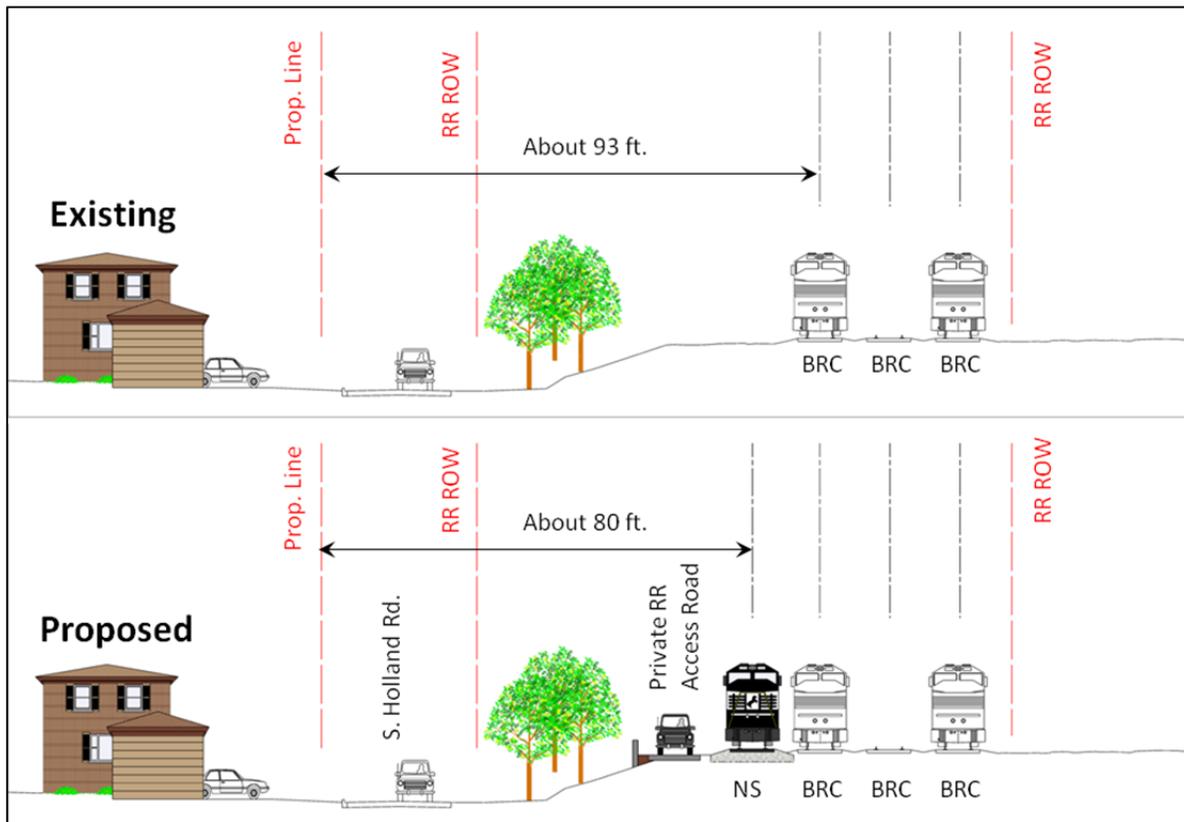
Alternate 80-2 and Existing Conditions, Looking North along BRC Tracks near 88th Street
